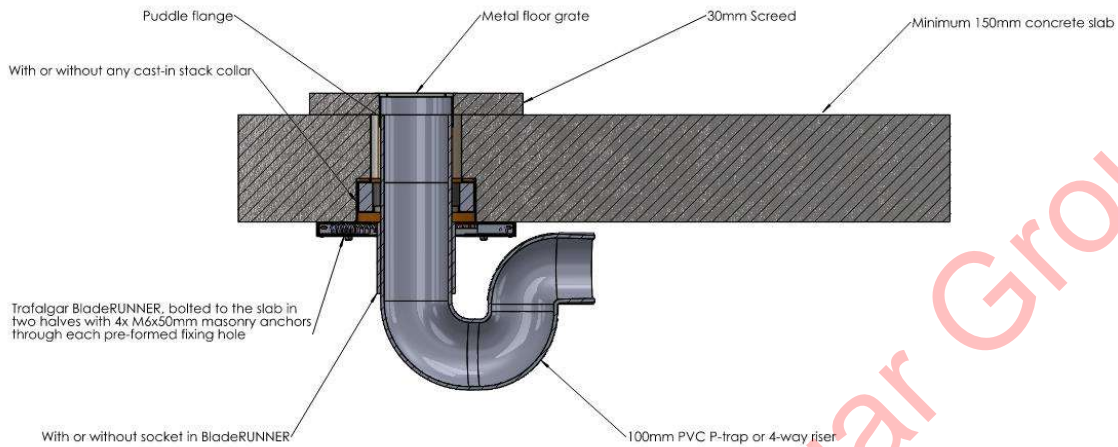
Trafalgar BladeRUNNER installation showing existing cast in collar on a Ø100mm uPVC floor waste gully.
